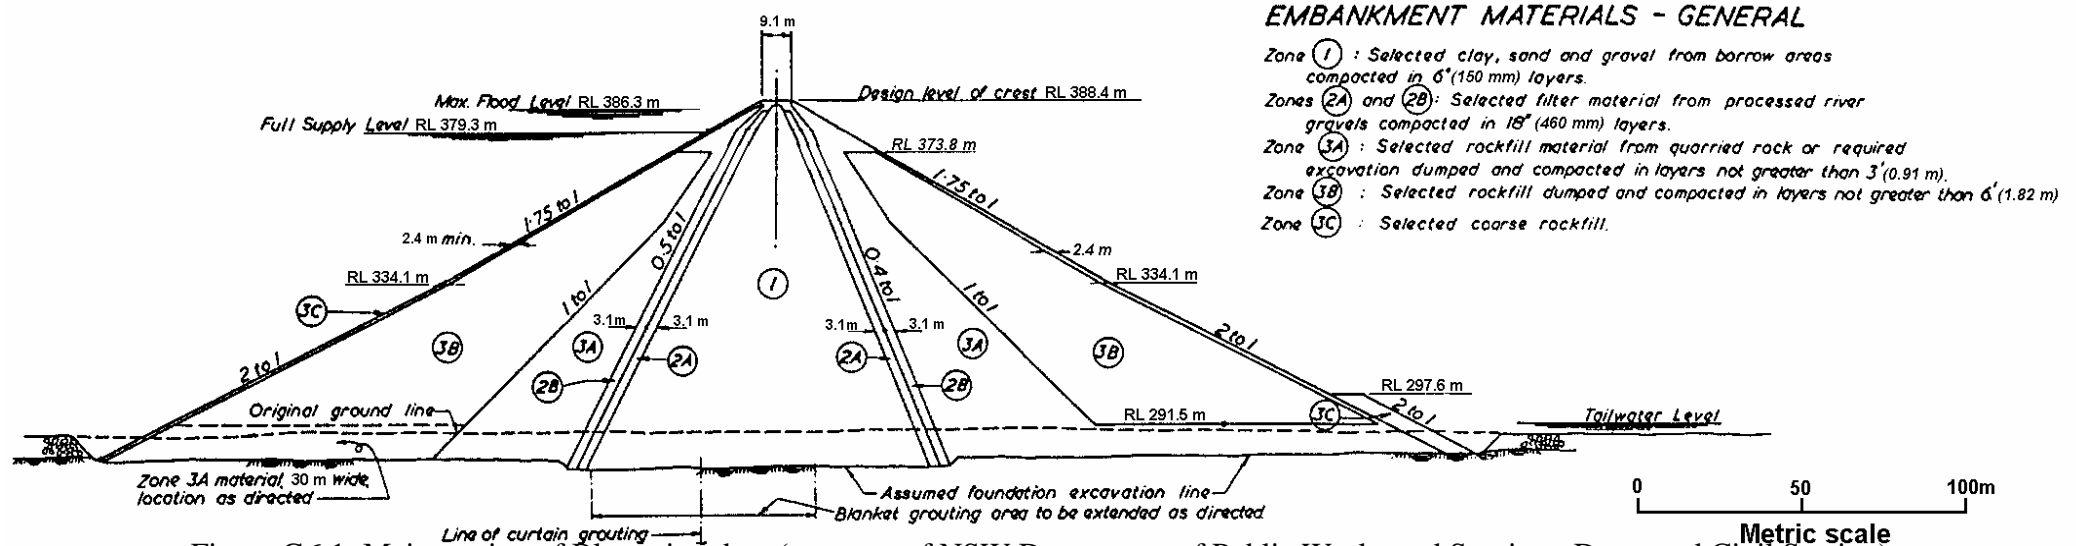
Main section of Blowering dam (courtesy of NSW Department of Public Works and Services, Dams and Civil Section).
